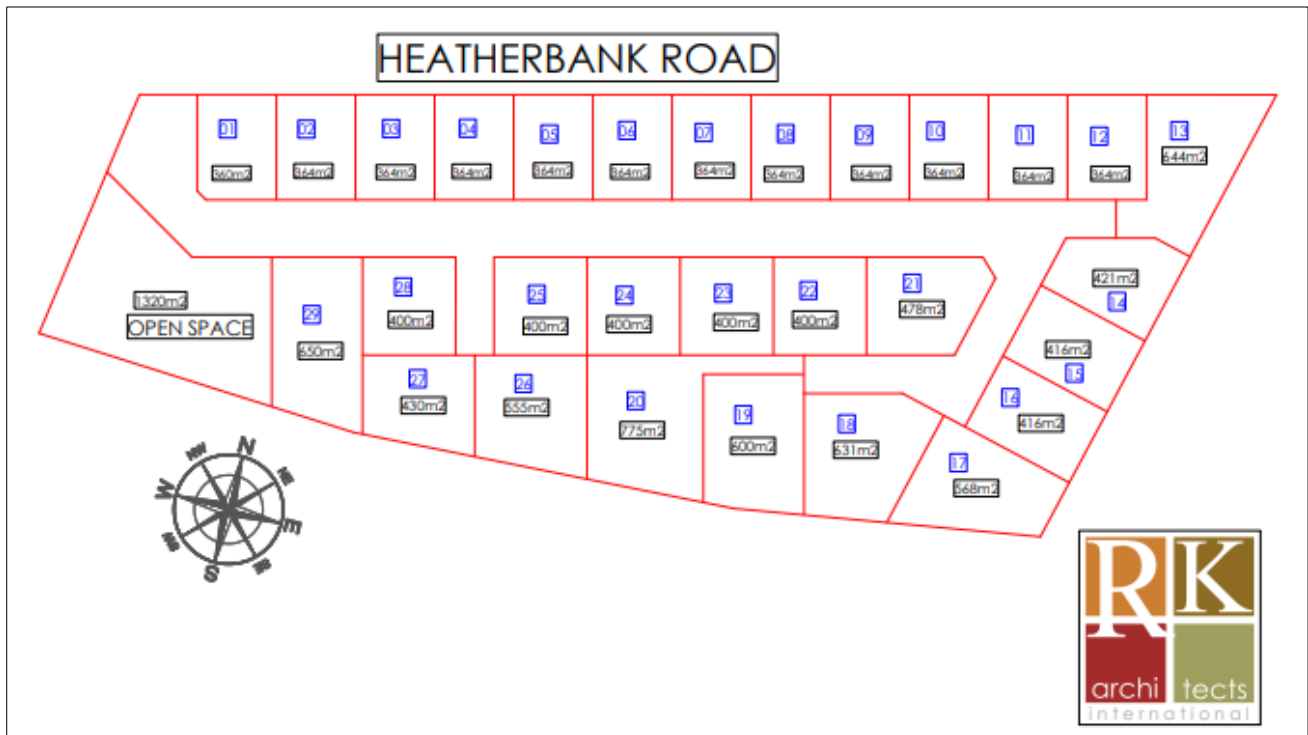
Layout of the proposed new “The Heath” housing development along Heatherbank Road in Theescombe.
